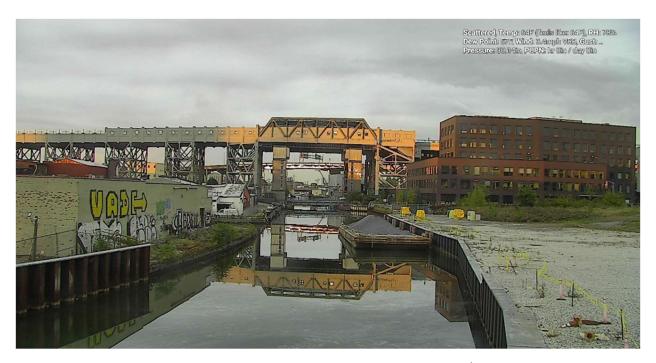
October 3, 2024. General Conditions in Canal north of 9th Street Bridge prior to work activities at 07:07. Light sheens noted.
